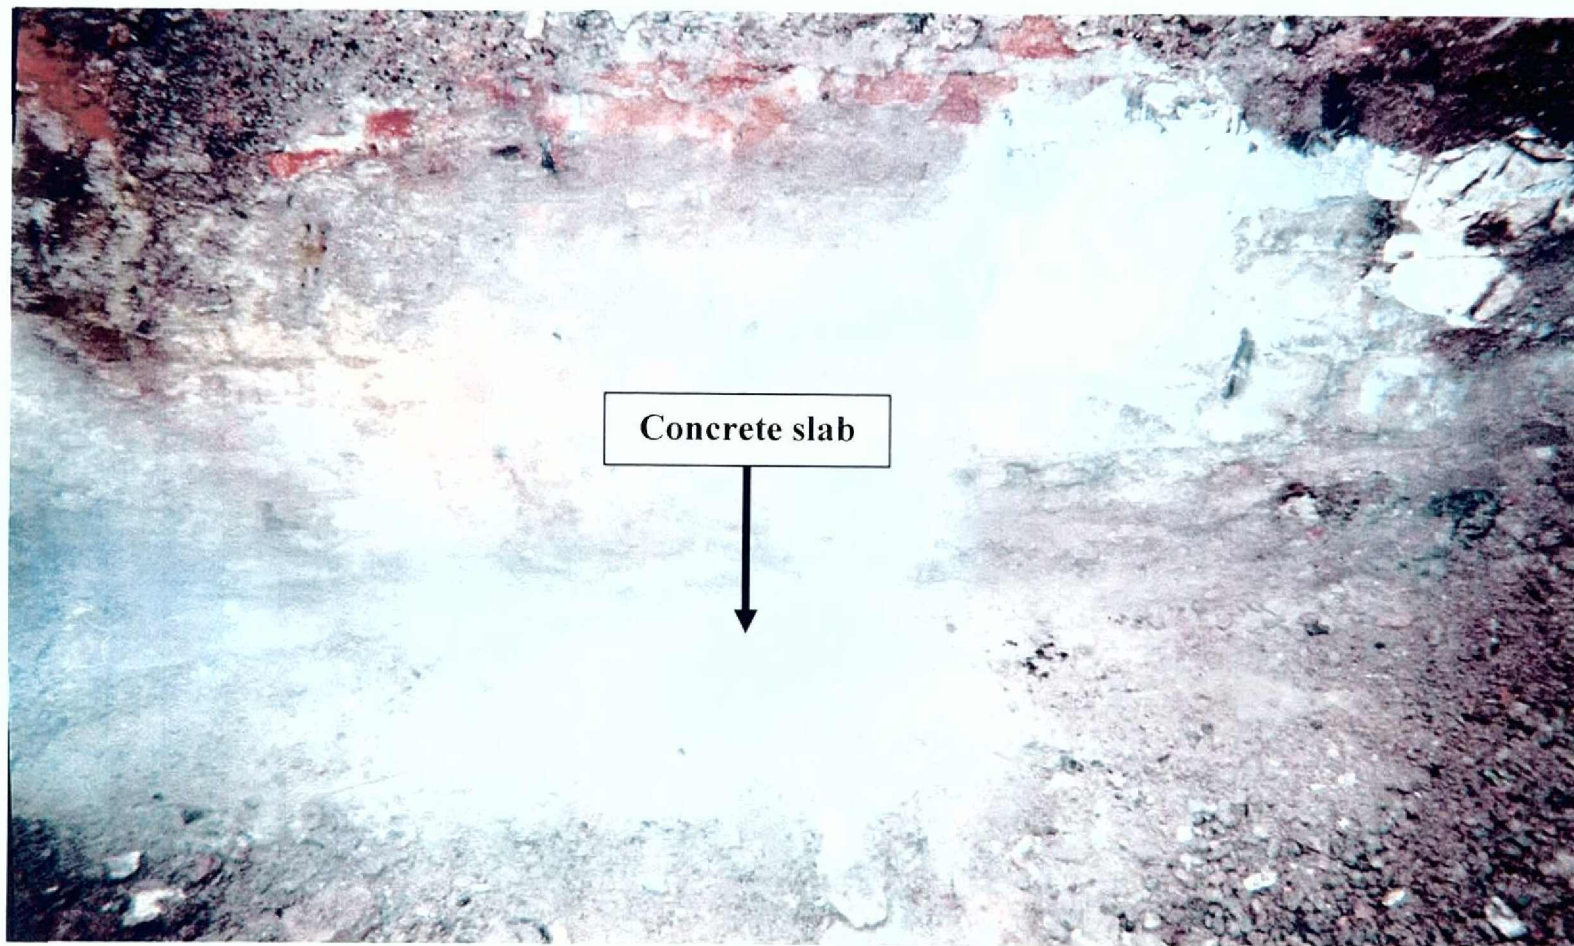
TP-5: Facing Northeast-Top view of wall dividing TP-5 (East) and TP-5 (West).
